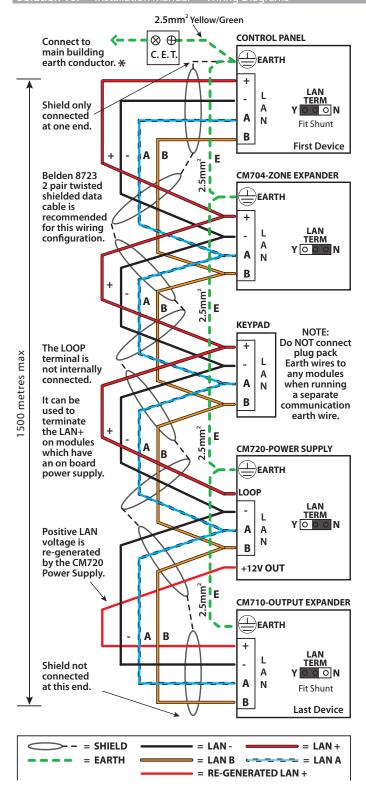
LAN Connection Using Twisted Pair Cable Recommended for LAN Lengths greater than 300 metres.
